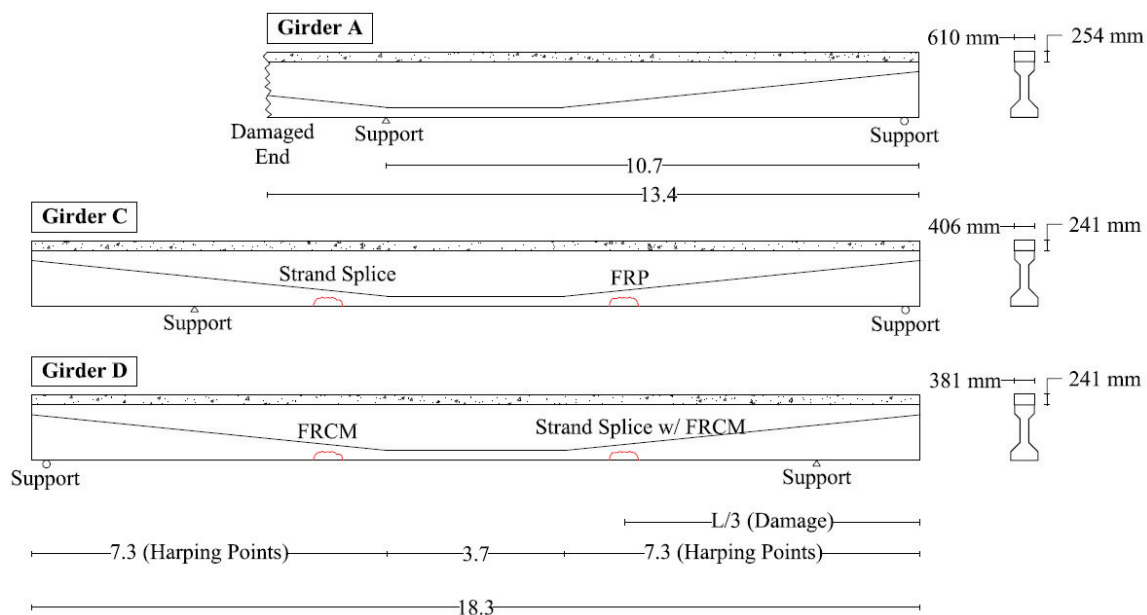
AASHTO Type III Girder Dimensions and Prestressing Details
